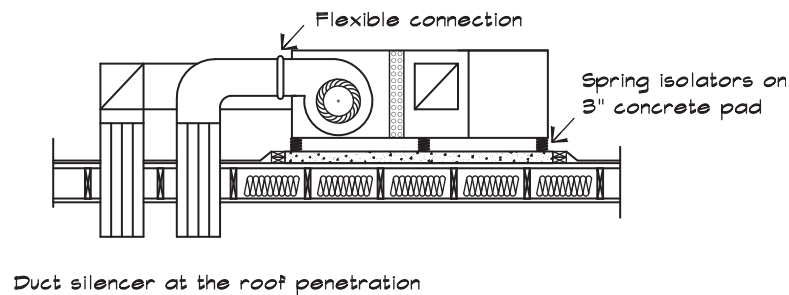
Roof-Mounted Packaged Air Handlers
